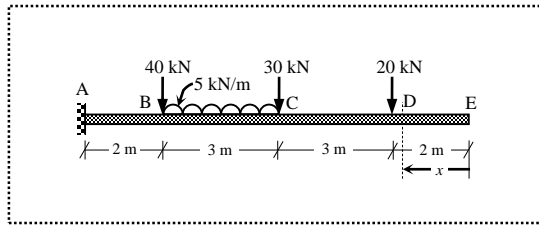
Cantilever beam with multiple loads (Example 2.15)
